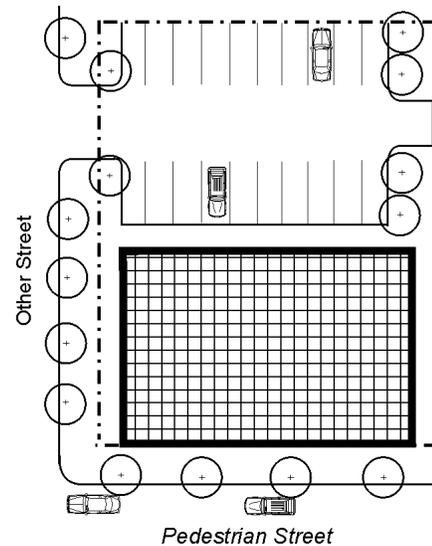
Along pedestrian streets, all parking facilities provided on site must be located at the side or rear of the building.
